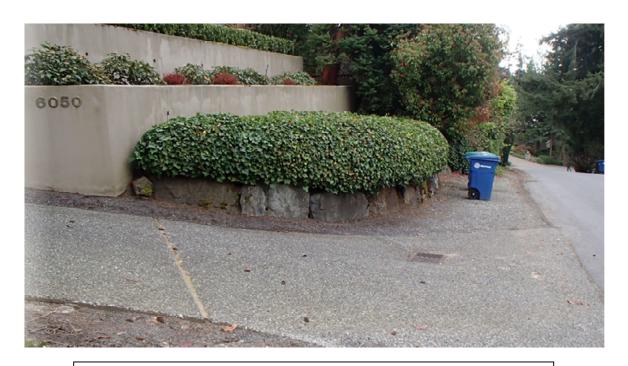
Looking southerly at CB #30a-35 adjacent House #6050.
